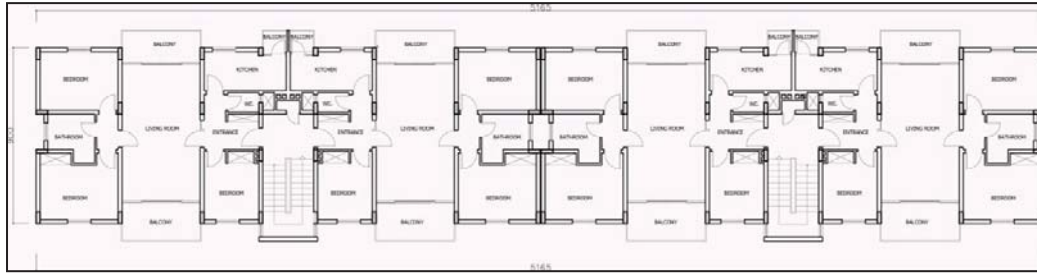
Floor plan layout of D (Source: İSDEMİR Archive, 2012 and revised by author)
